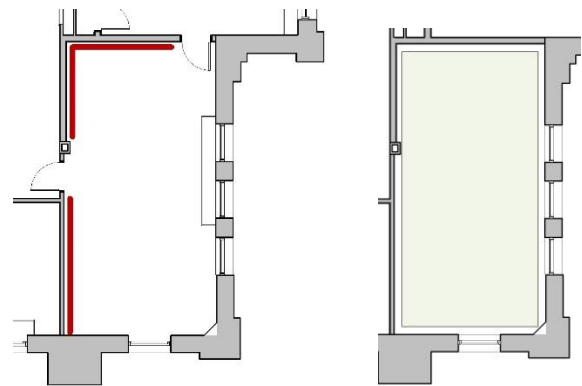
Governor's Formal Office Floor Plan and Reflected Ceiling Plan
